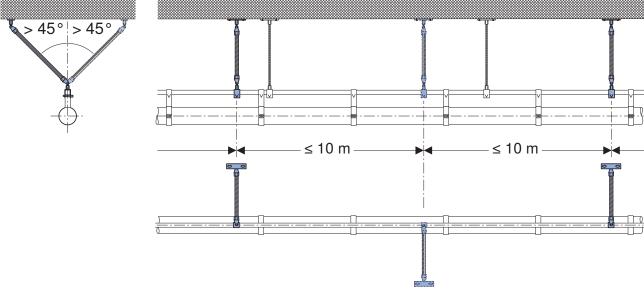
Positioning of Geberit Pluvia support sets installed sideways on the ceiling
